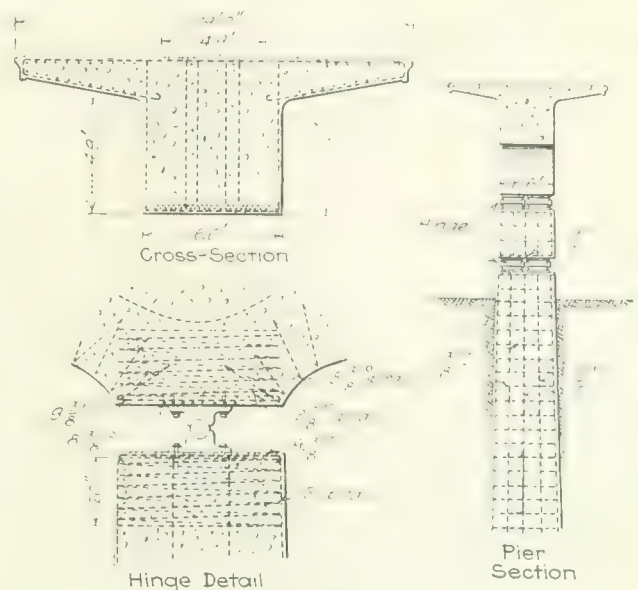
DETAILS OF MAIN GIRDER AND HINGED PIER
